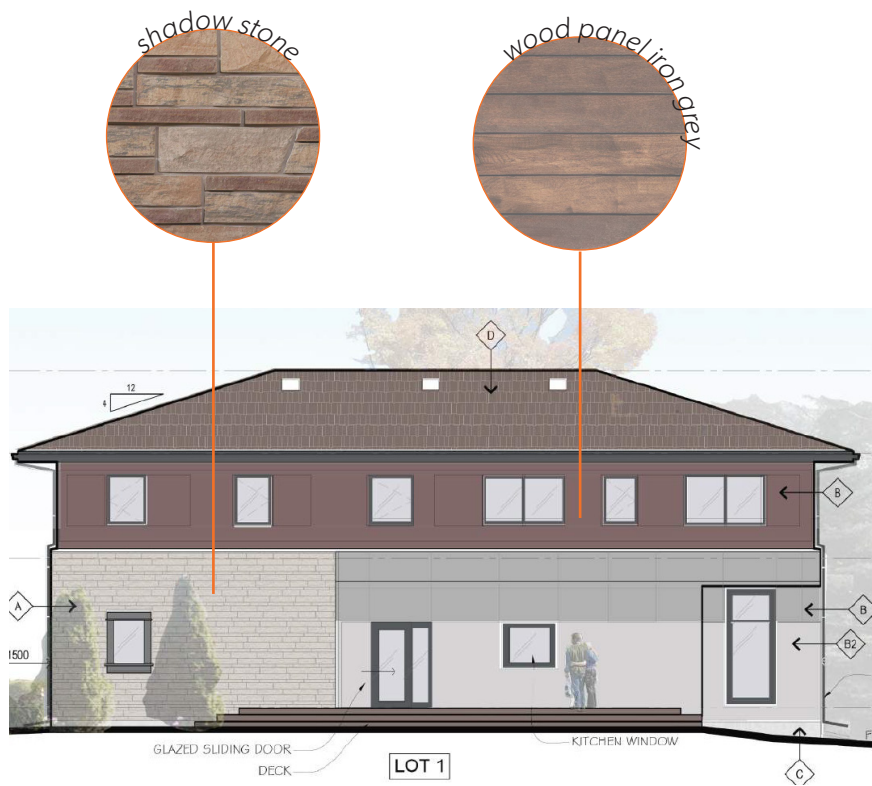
Render of North Elevation Lot 1; V&A Architects, 2019.06.10
